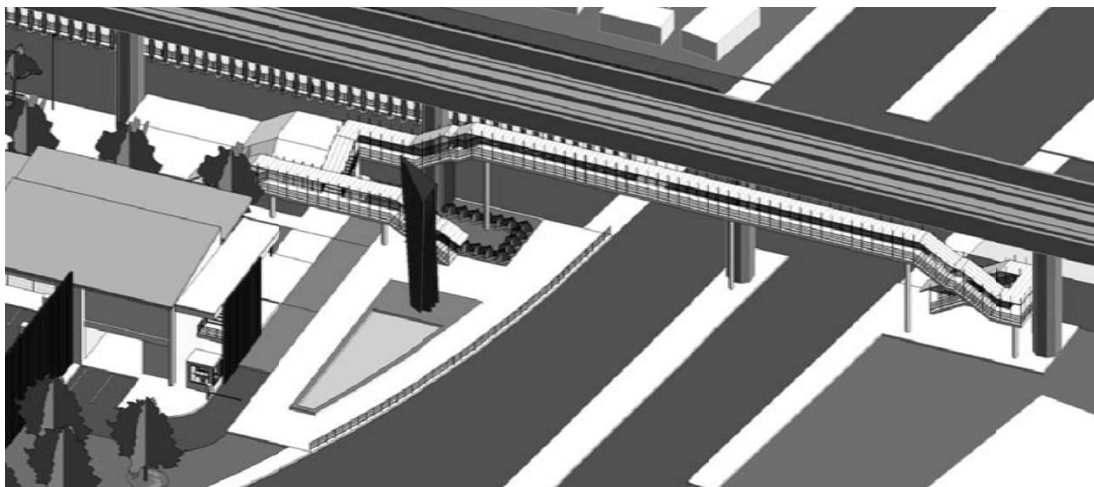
Crossing bridge across *Thanon Srinagarindra* connecting station plaza and sidewalk/ walkway across
